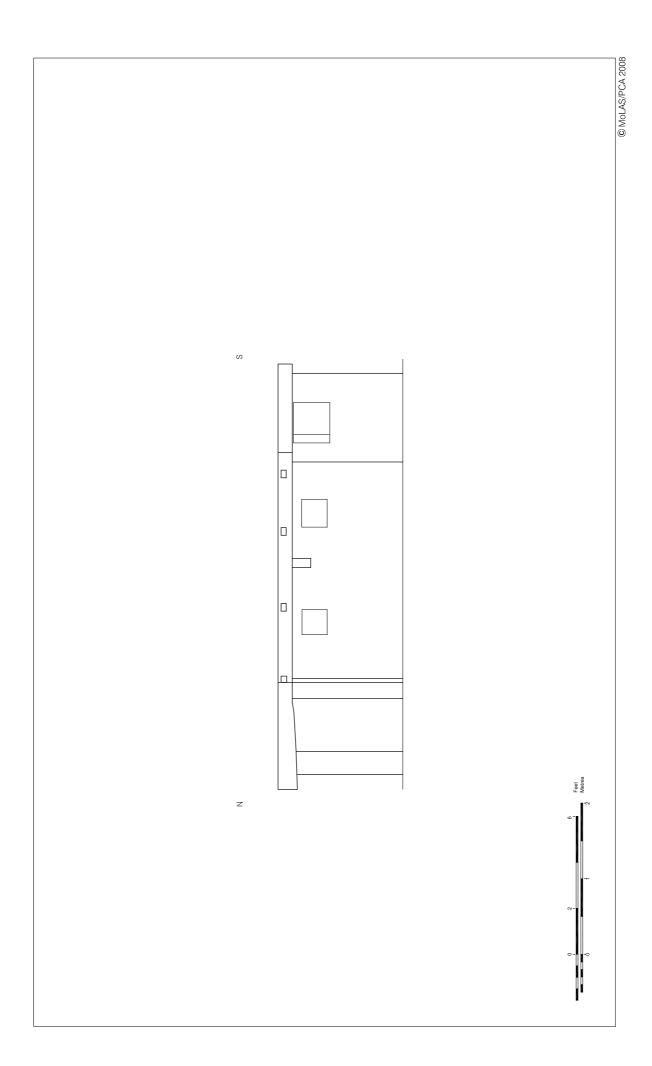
Building 6, pillbox, west facing section 1:50 at A4
